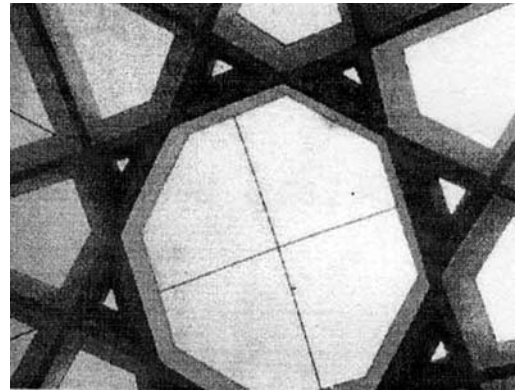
29: Azra Shaheen House, Khayaban-e-Hilal, Phase-VI, DHA, Karachi, finished in 1998. Organized around a central atrium. Fig 28 & 29 the house uses fair-faced load-bearing concrete block walls and pyramidal domes supported by concrete beams. Photos by Hassan Abbasi, 3rd Year, Dept. of Architecture, NED.
